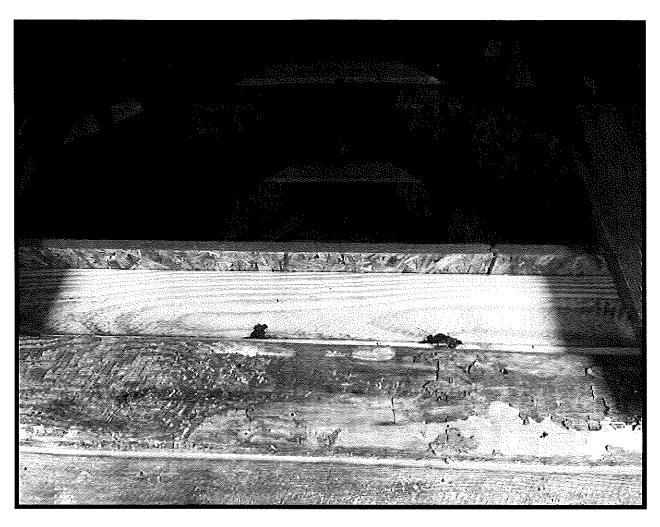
The upper ceiling joists have been reinforced with 2 x 10's and 34" plywood.
